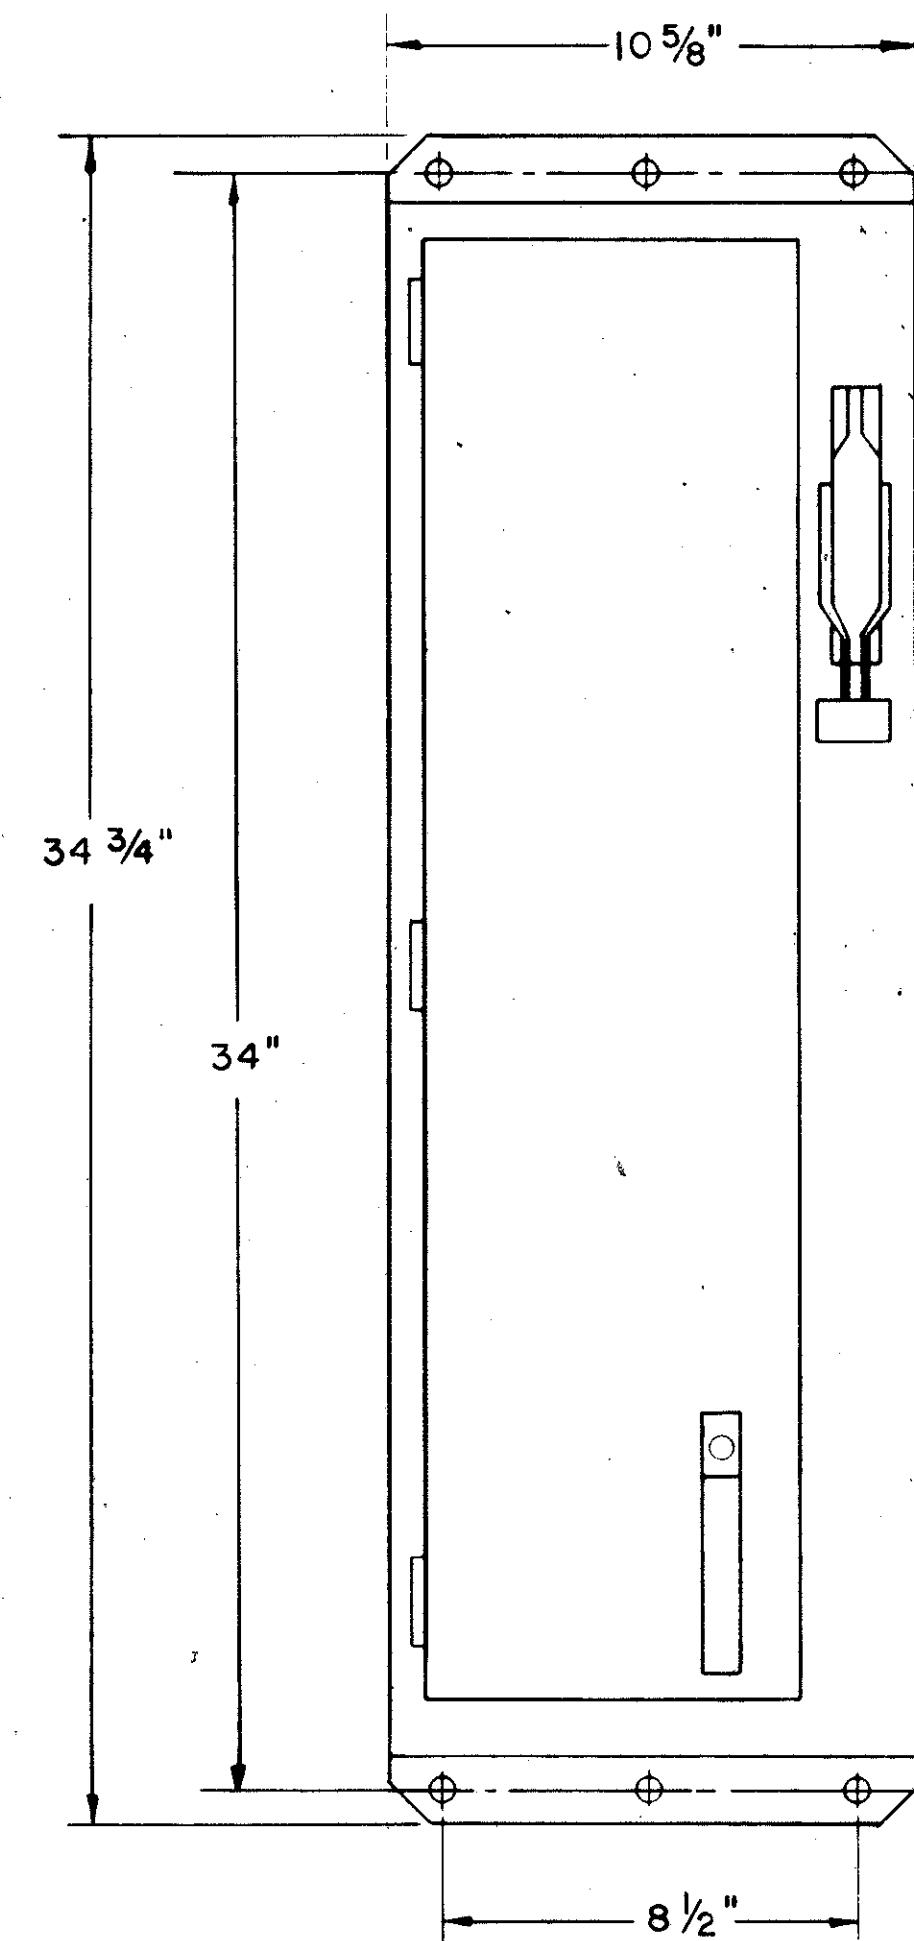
DETAILS ON THIS SHEET SHALL APPLY TO EACH OVERHEAD SIGN STRUCTURE TO SUPPORT ILLUMINATED SIGNS. ELECTRIC SERVICE SHALL ENTER THE STRUCTURE THROUGH A 2" RIGID STEEL GALVANIZED CONDUIT PLACED IN THE STRUCTURE FOUNDATION. SERVICE WIRES SHALL ENTER THE DISCONNECT SWITCH OR COMBINATION SWITCH CONTACTOR THROUGH AN INSULATED CHASE NIPPLE TO BE FIELD INSTALLED AS SHOWN IN DETAIL. FIELD DETERMINE SIZE OF NIPPLE. SIGN LOAD WIRES AND CONTROL WIRES (IF REQUIRED) SHALL ENTER SIGN STRUCTURE AND CONTINUE UPWARD TO PROPER OUTLET. CONTROL PILOT DEVICE SHALL BE A PHOTO-ELECTRIC CELL UNIT AS SPECIFIED IN THE ELECTRICAL NOTES AND INSTALLED ON THE CAP OF THE UPRIGHT STRUCTURE MEMBER.
